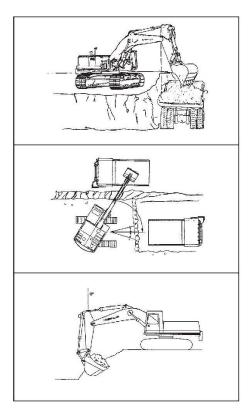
Schematic of Hydraulic Excavator Loading a Truck (Source: Caterpillar, 2007)
